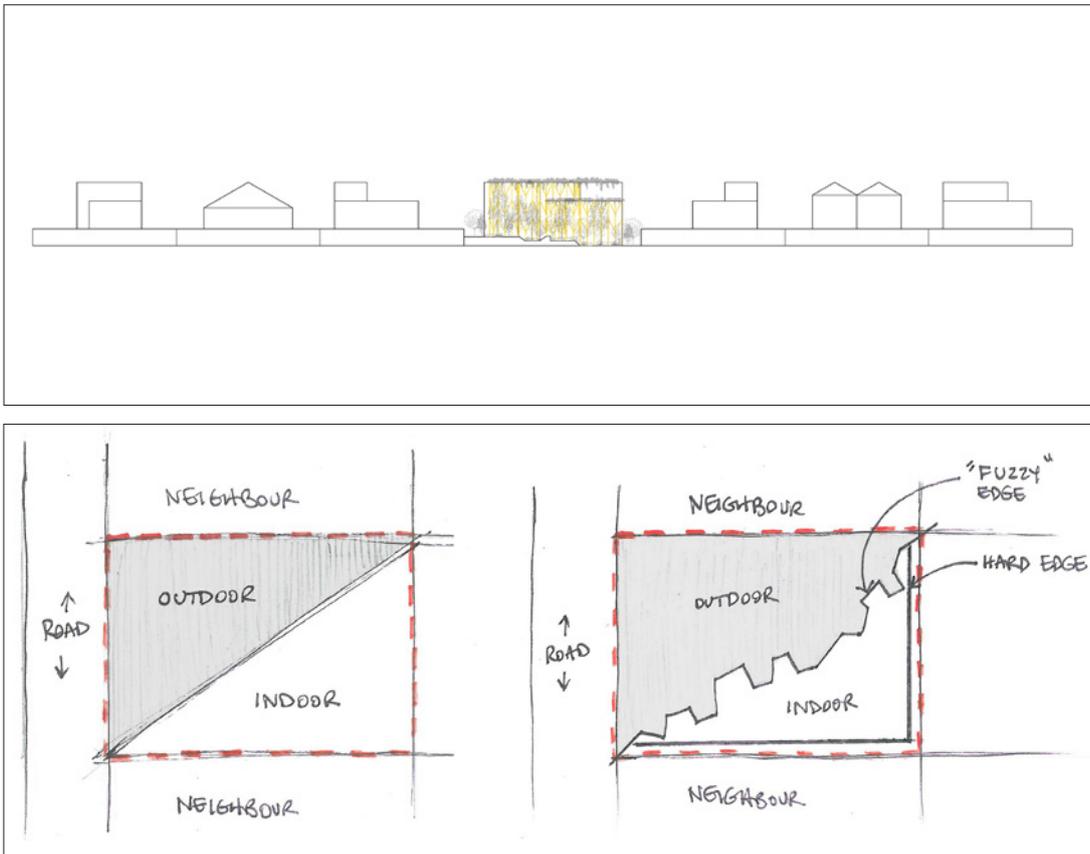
TRELLIS HOUSE Street facade concept elevation.
